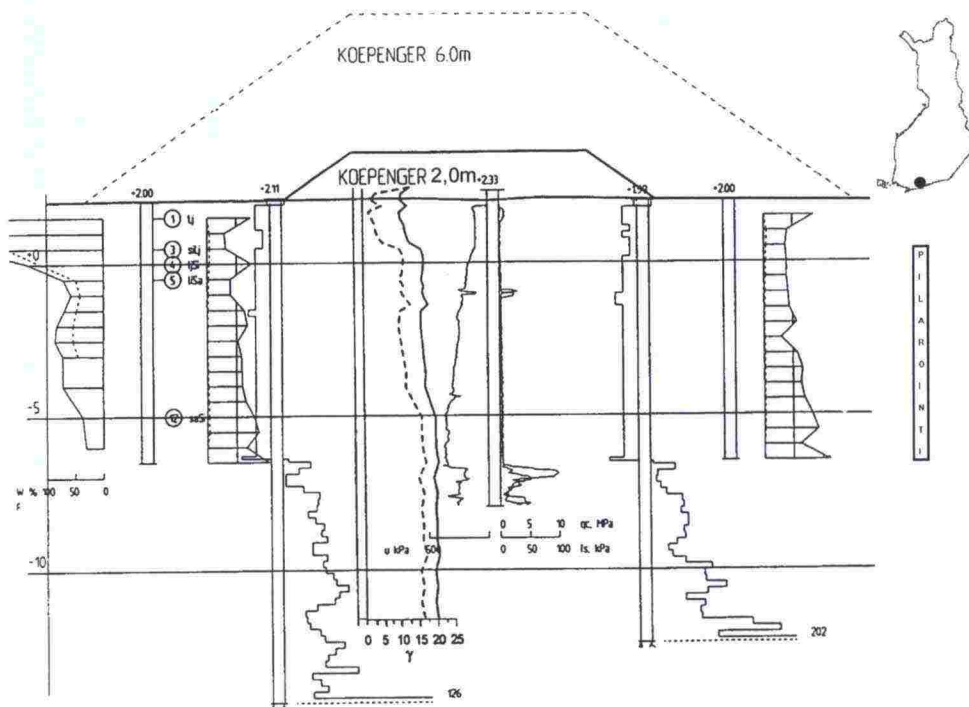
Subsoil conditions in test site and the cross sections of both embankments.
